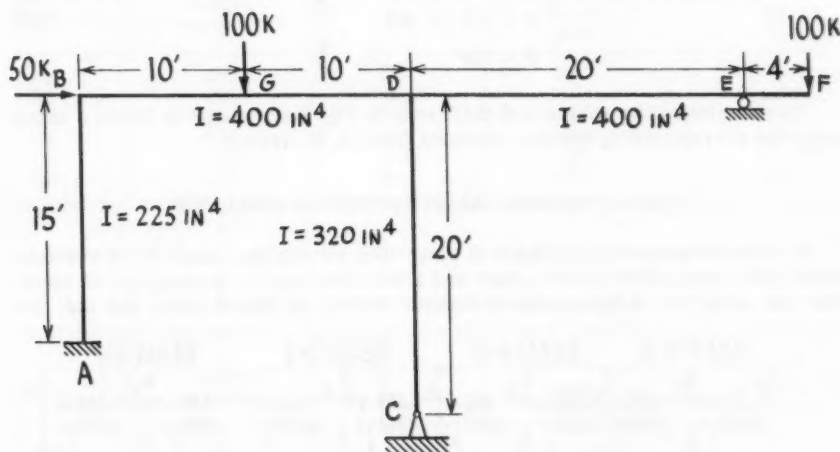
EXAMPLE BUILDING FRAME PROBLEM
